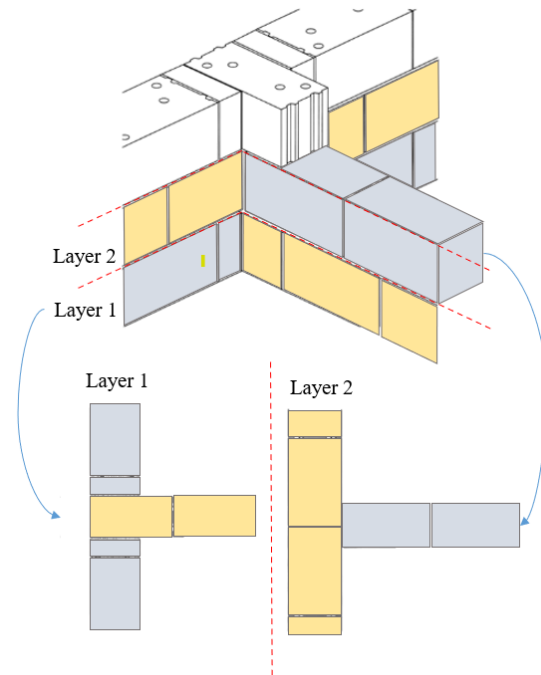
Illustrates the layer-by-layer changing priority wall status between walls and its relevance on the connection point brick placement adaptation [13]
